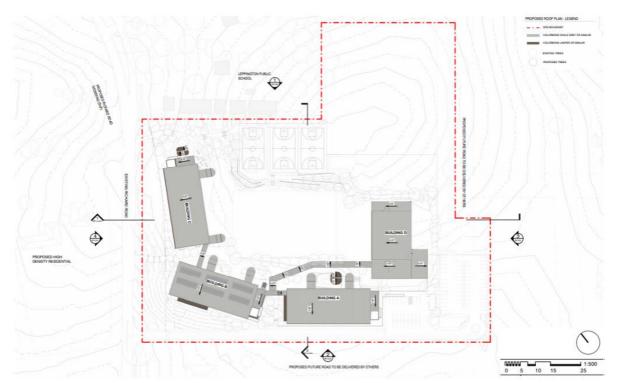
Proposed roof plan showing location of photovoltaic panels (Source: DJRD)
